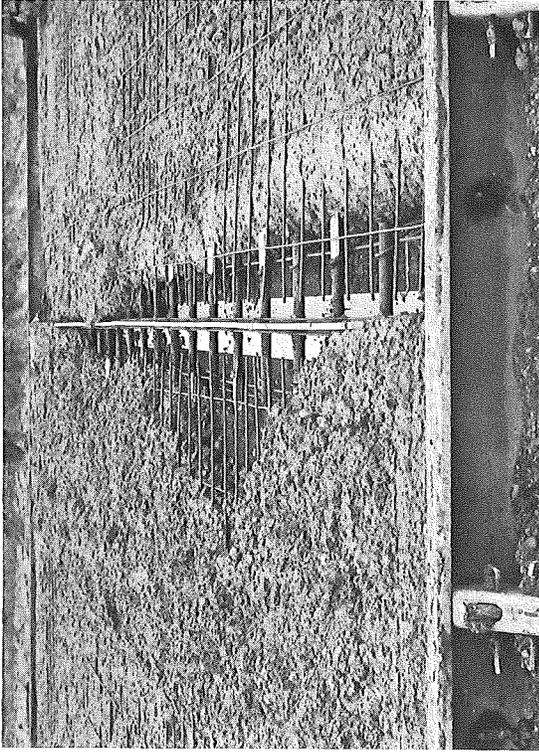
Condition of expansion-contraction joint assembly during the spreading of first course.
